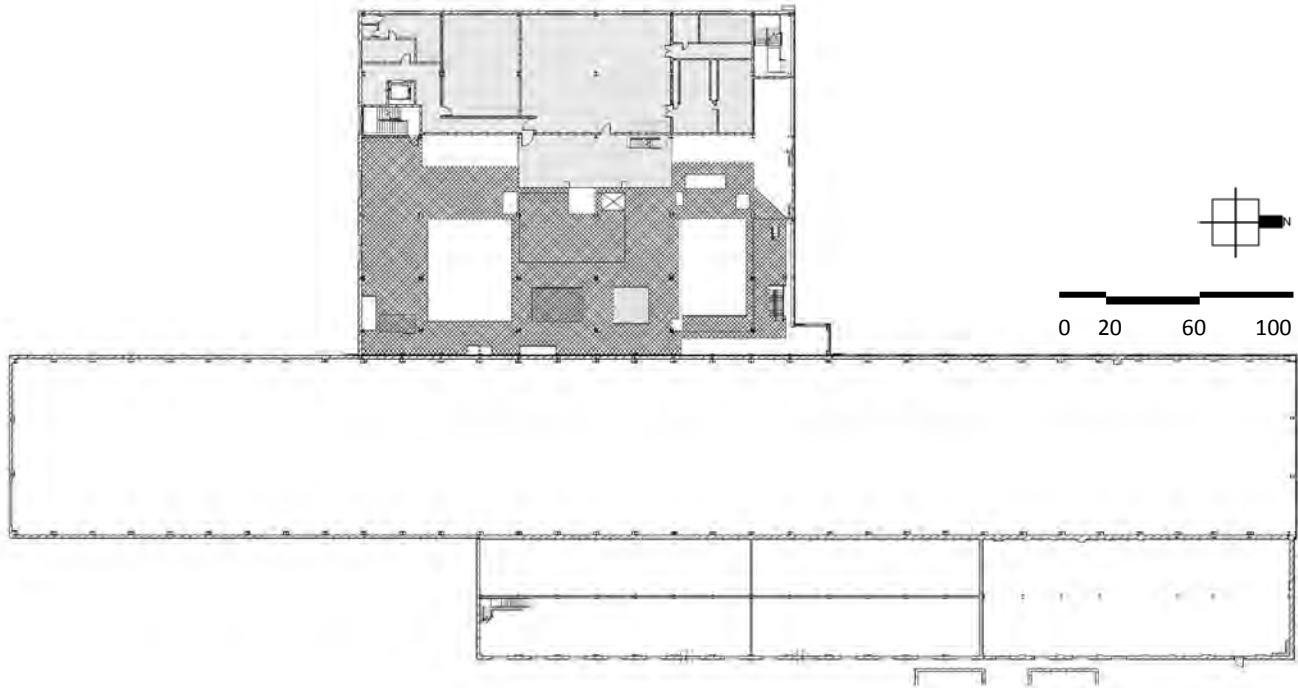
Second Floor Plan. Alley Poyner Macchietto Architecture, 2014.
